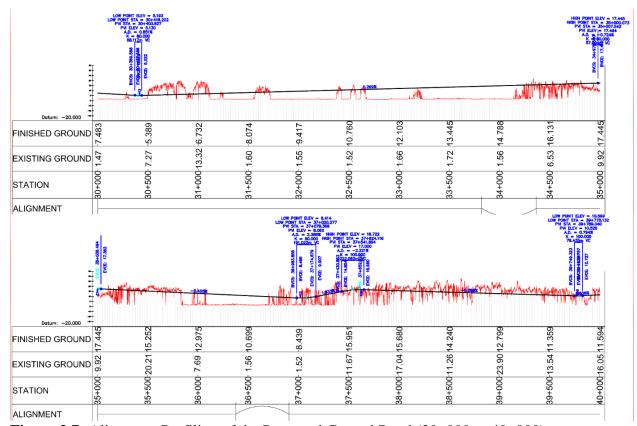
Alignment Profiling of the Proposed Coastal Road (30+000 to 40+000)
